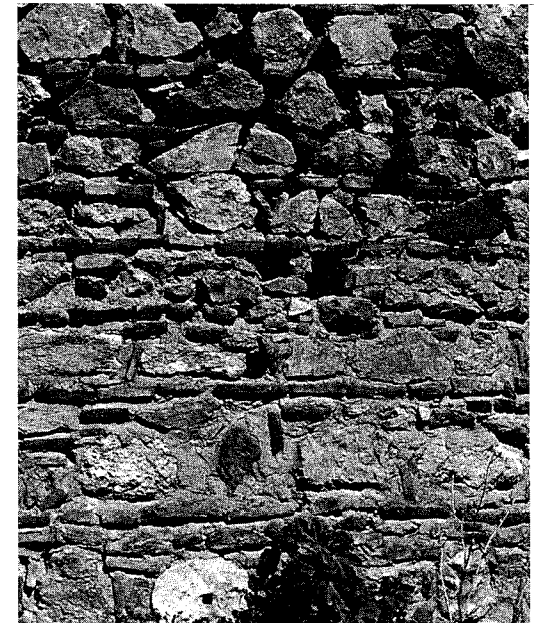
Outer Wall, detail of typical masonry on T110a
